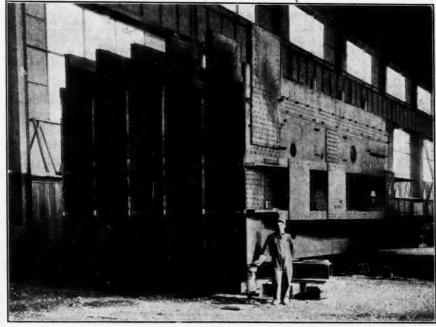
VIEW OF TOP SECTION OF INNER COLUMNS.
